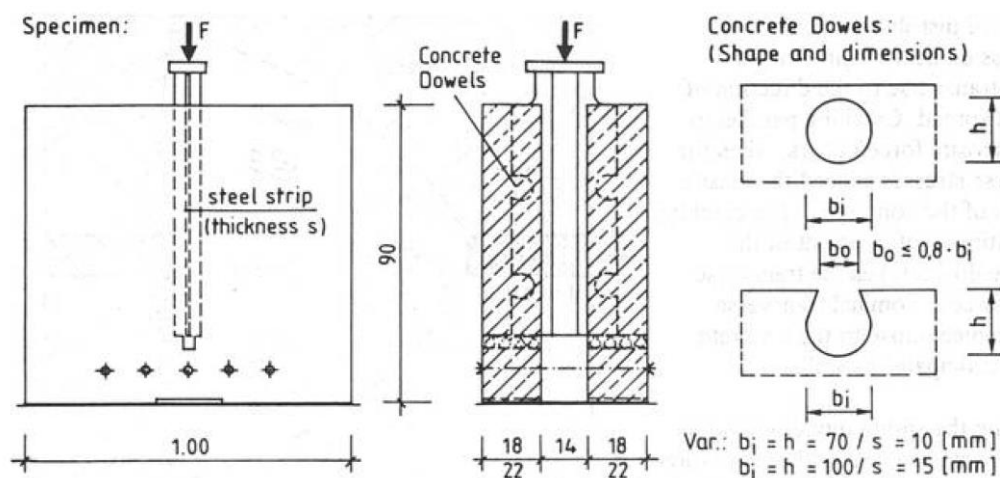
Push-out test and geometries of concrete dowels [Kr1997b]
